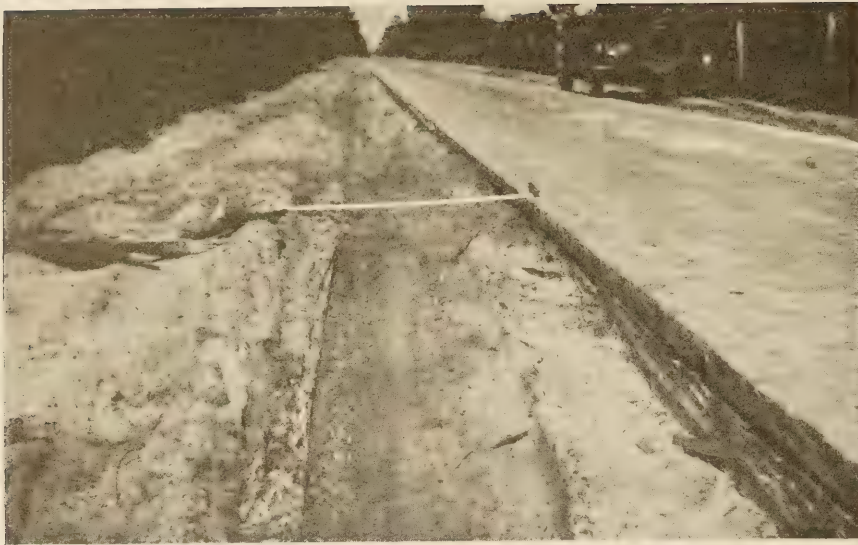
(LEFT).—SHOWING GOOD CONDITION OF CEMENT-GROUT-FILLED SURFACE NOTWITHSTANDING THE LOSS OF THE SHOULDERS AND WOODEN CURBS.
